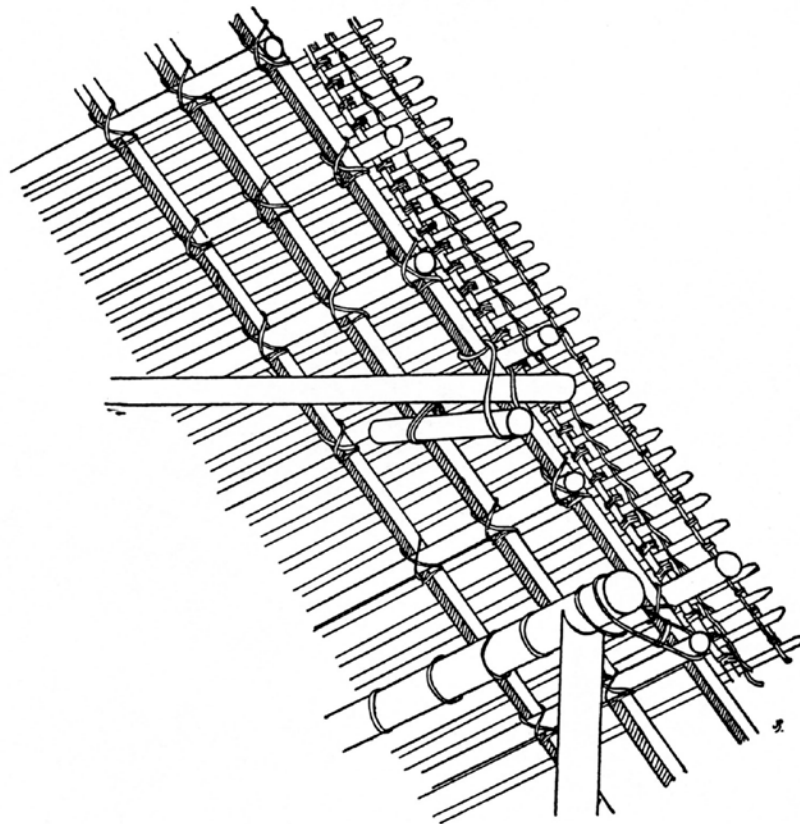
Roof construction of the ceremonial house Plate XXX.2
